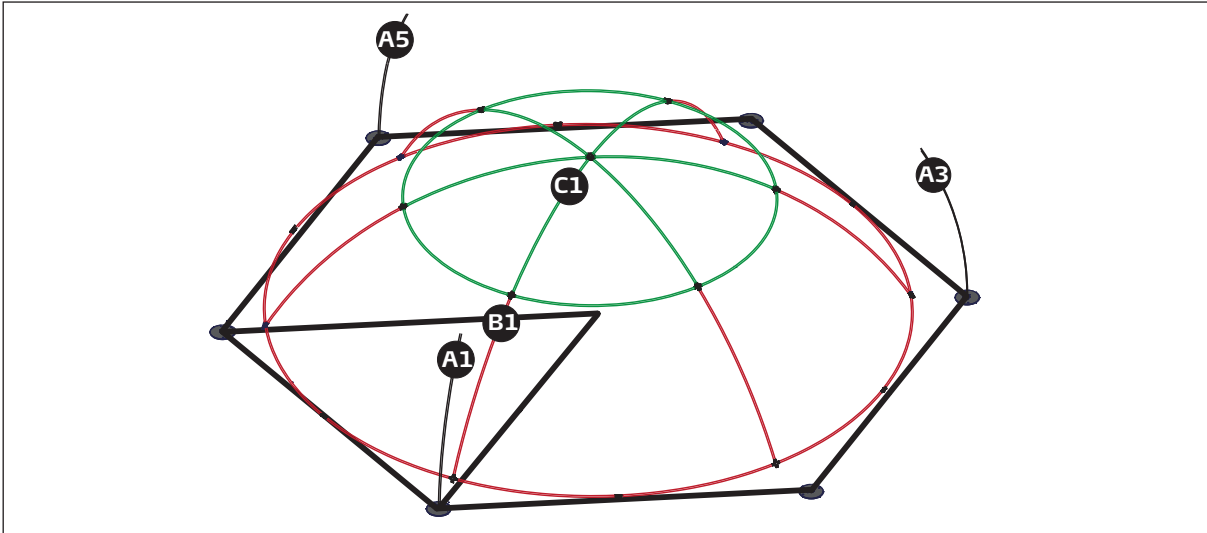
The final step of completing the B-layer: Mounting the remaining three poles and retightening the finger screws of the top connecting piece.
